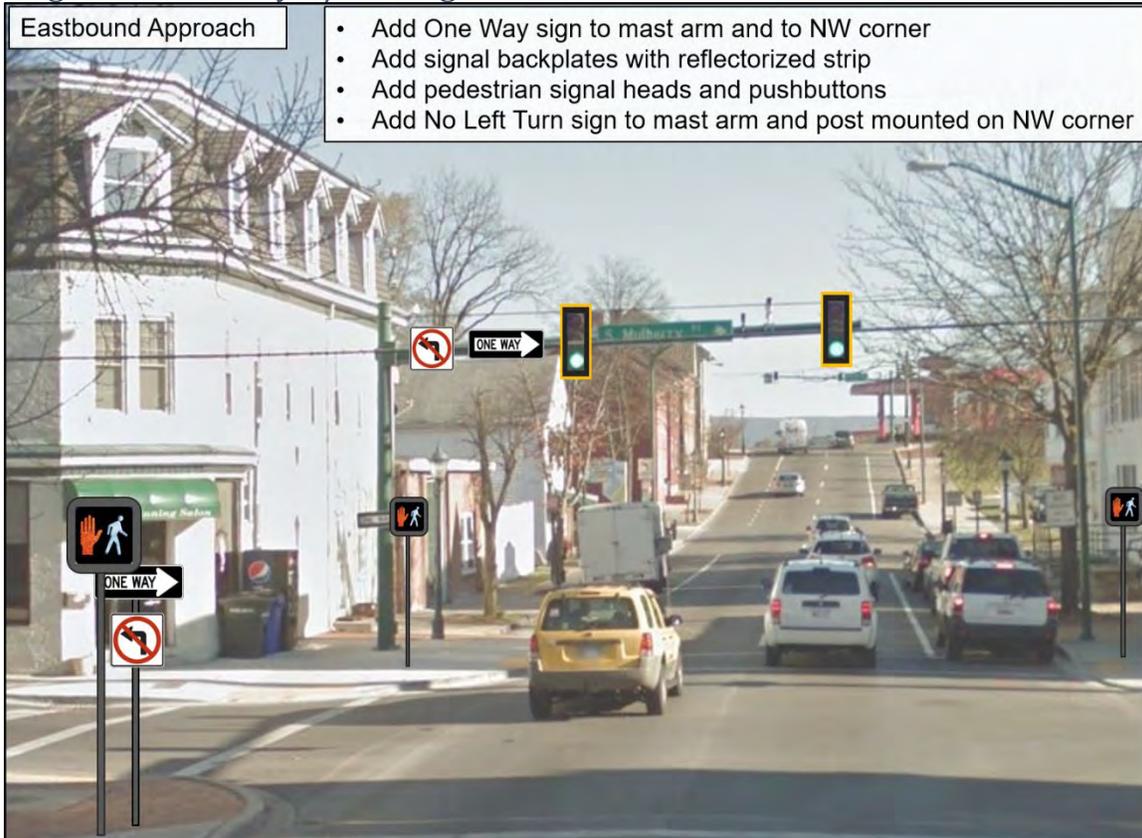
Locust St/Washington St Intersection – Eastbound Recommendations
